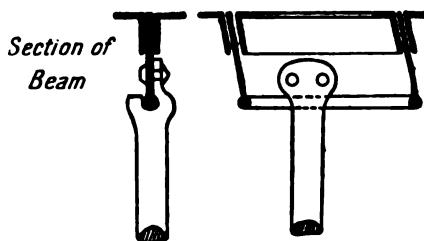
Connection of Pillar Head to Bulb Plate Beam.
